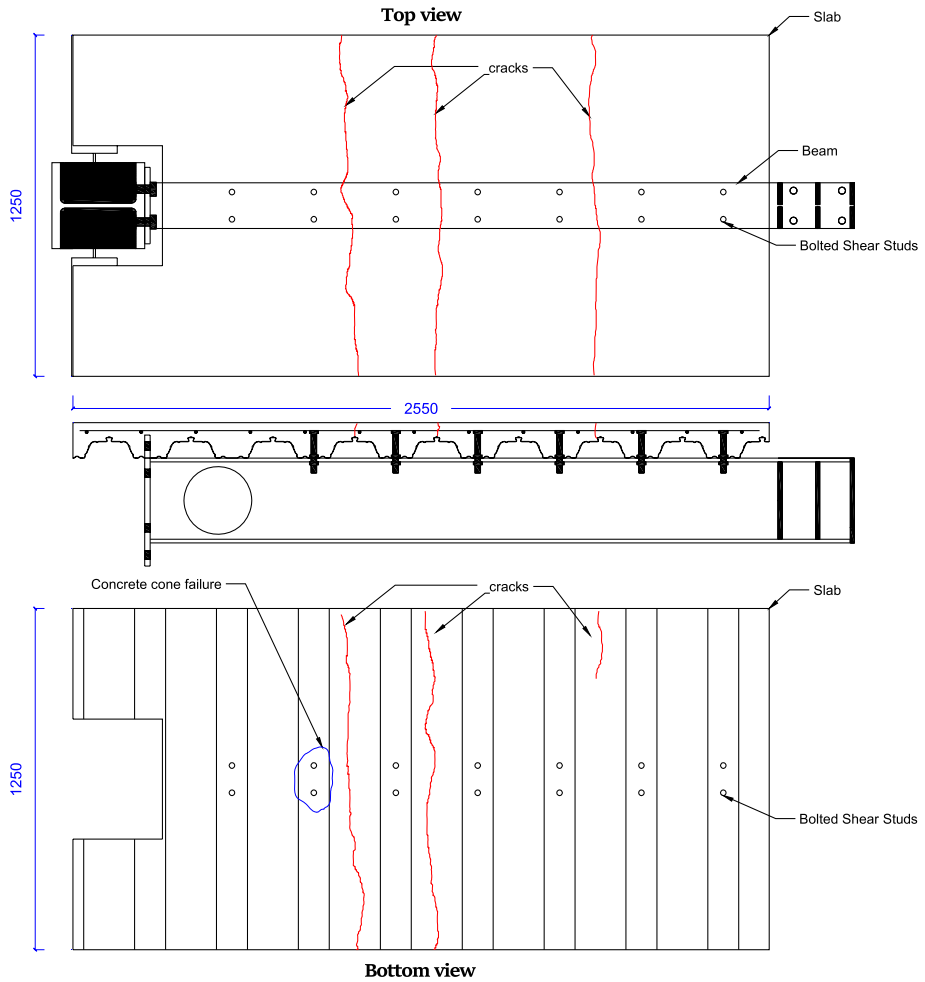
Observed crack pattern in RWS-L-retrofit connection specimen and concrete cone failure (mm)
